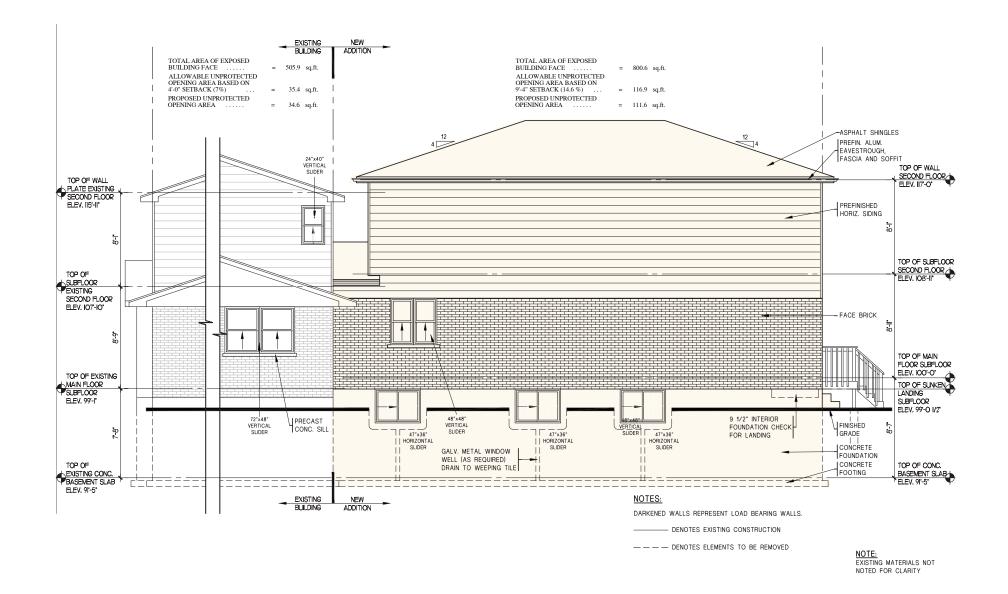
Right Side Elevation prepared by Orchard Design Studio Inc
